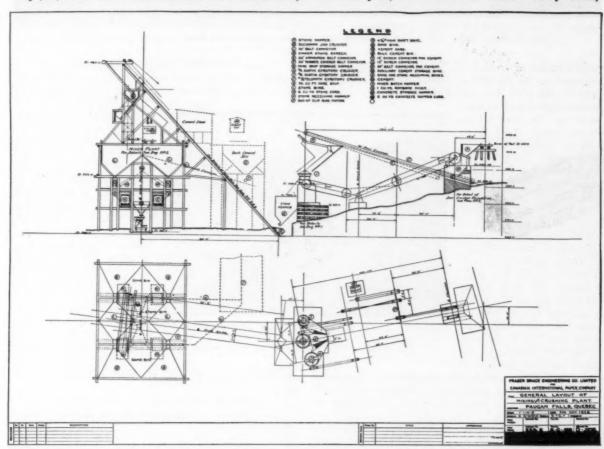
Elevation and Plan of the Mixing and Crushing Plant at Paugan Falls
